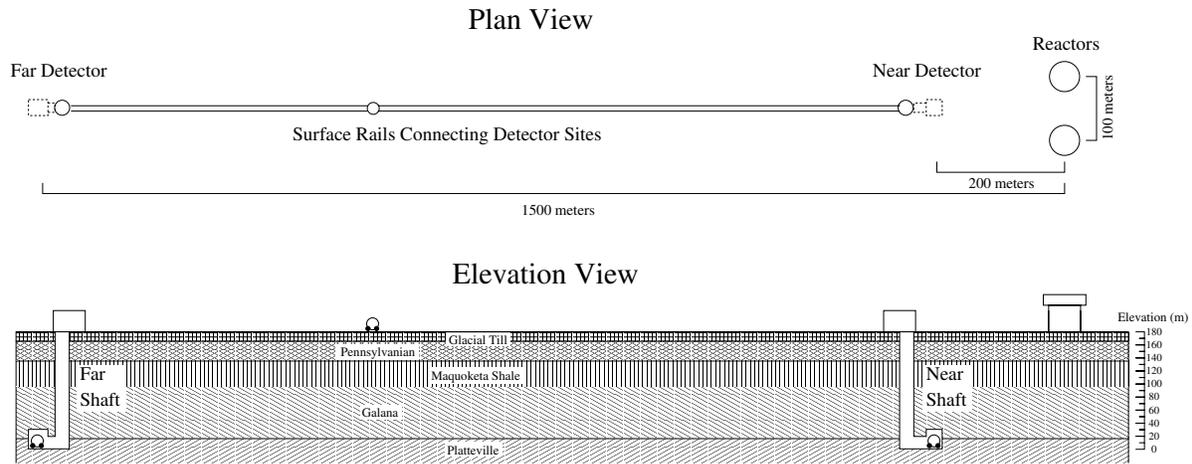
Plan and elevation views of the proposed layout of the experimental facility are shown. The elevation view shows the the major geological strata and their approximate elevation, in meters above sea level. Buildings, shafts and detectors are not drawn to scale.
